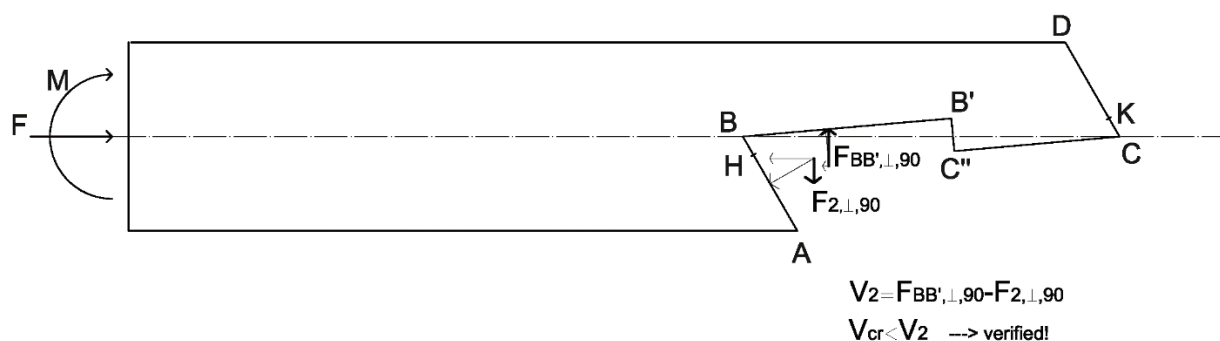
FM II. Shear/ tension perpendicular to the grains failure.
